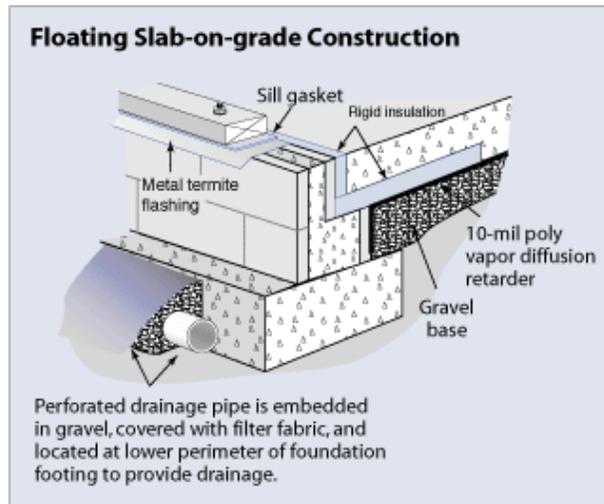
Floating slab-on-grade construction (<http://www.hometips.com>).
